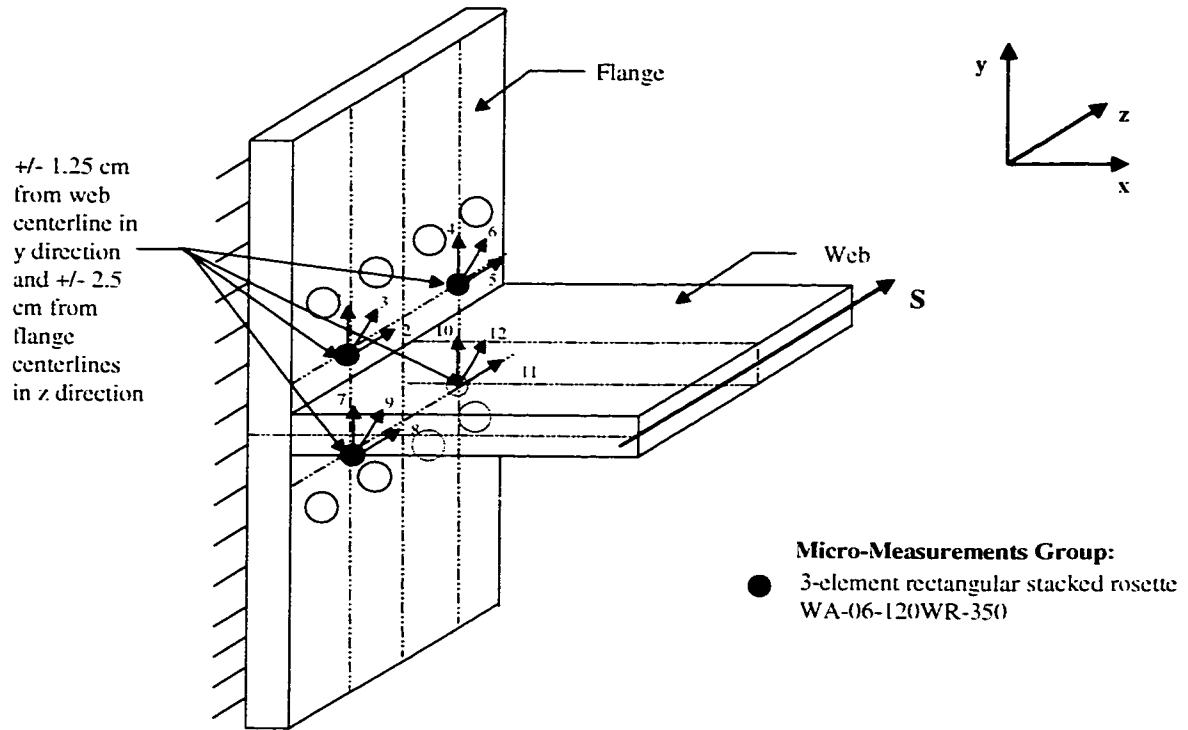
Rail Shear Specimen Instrumentation Layout Isometric.
